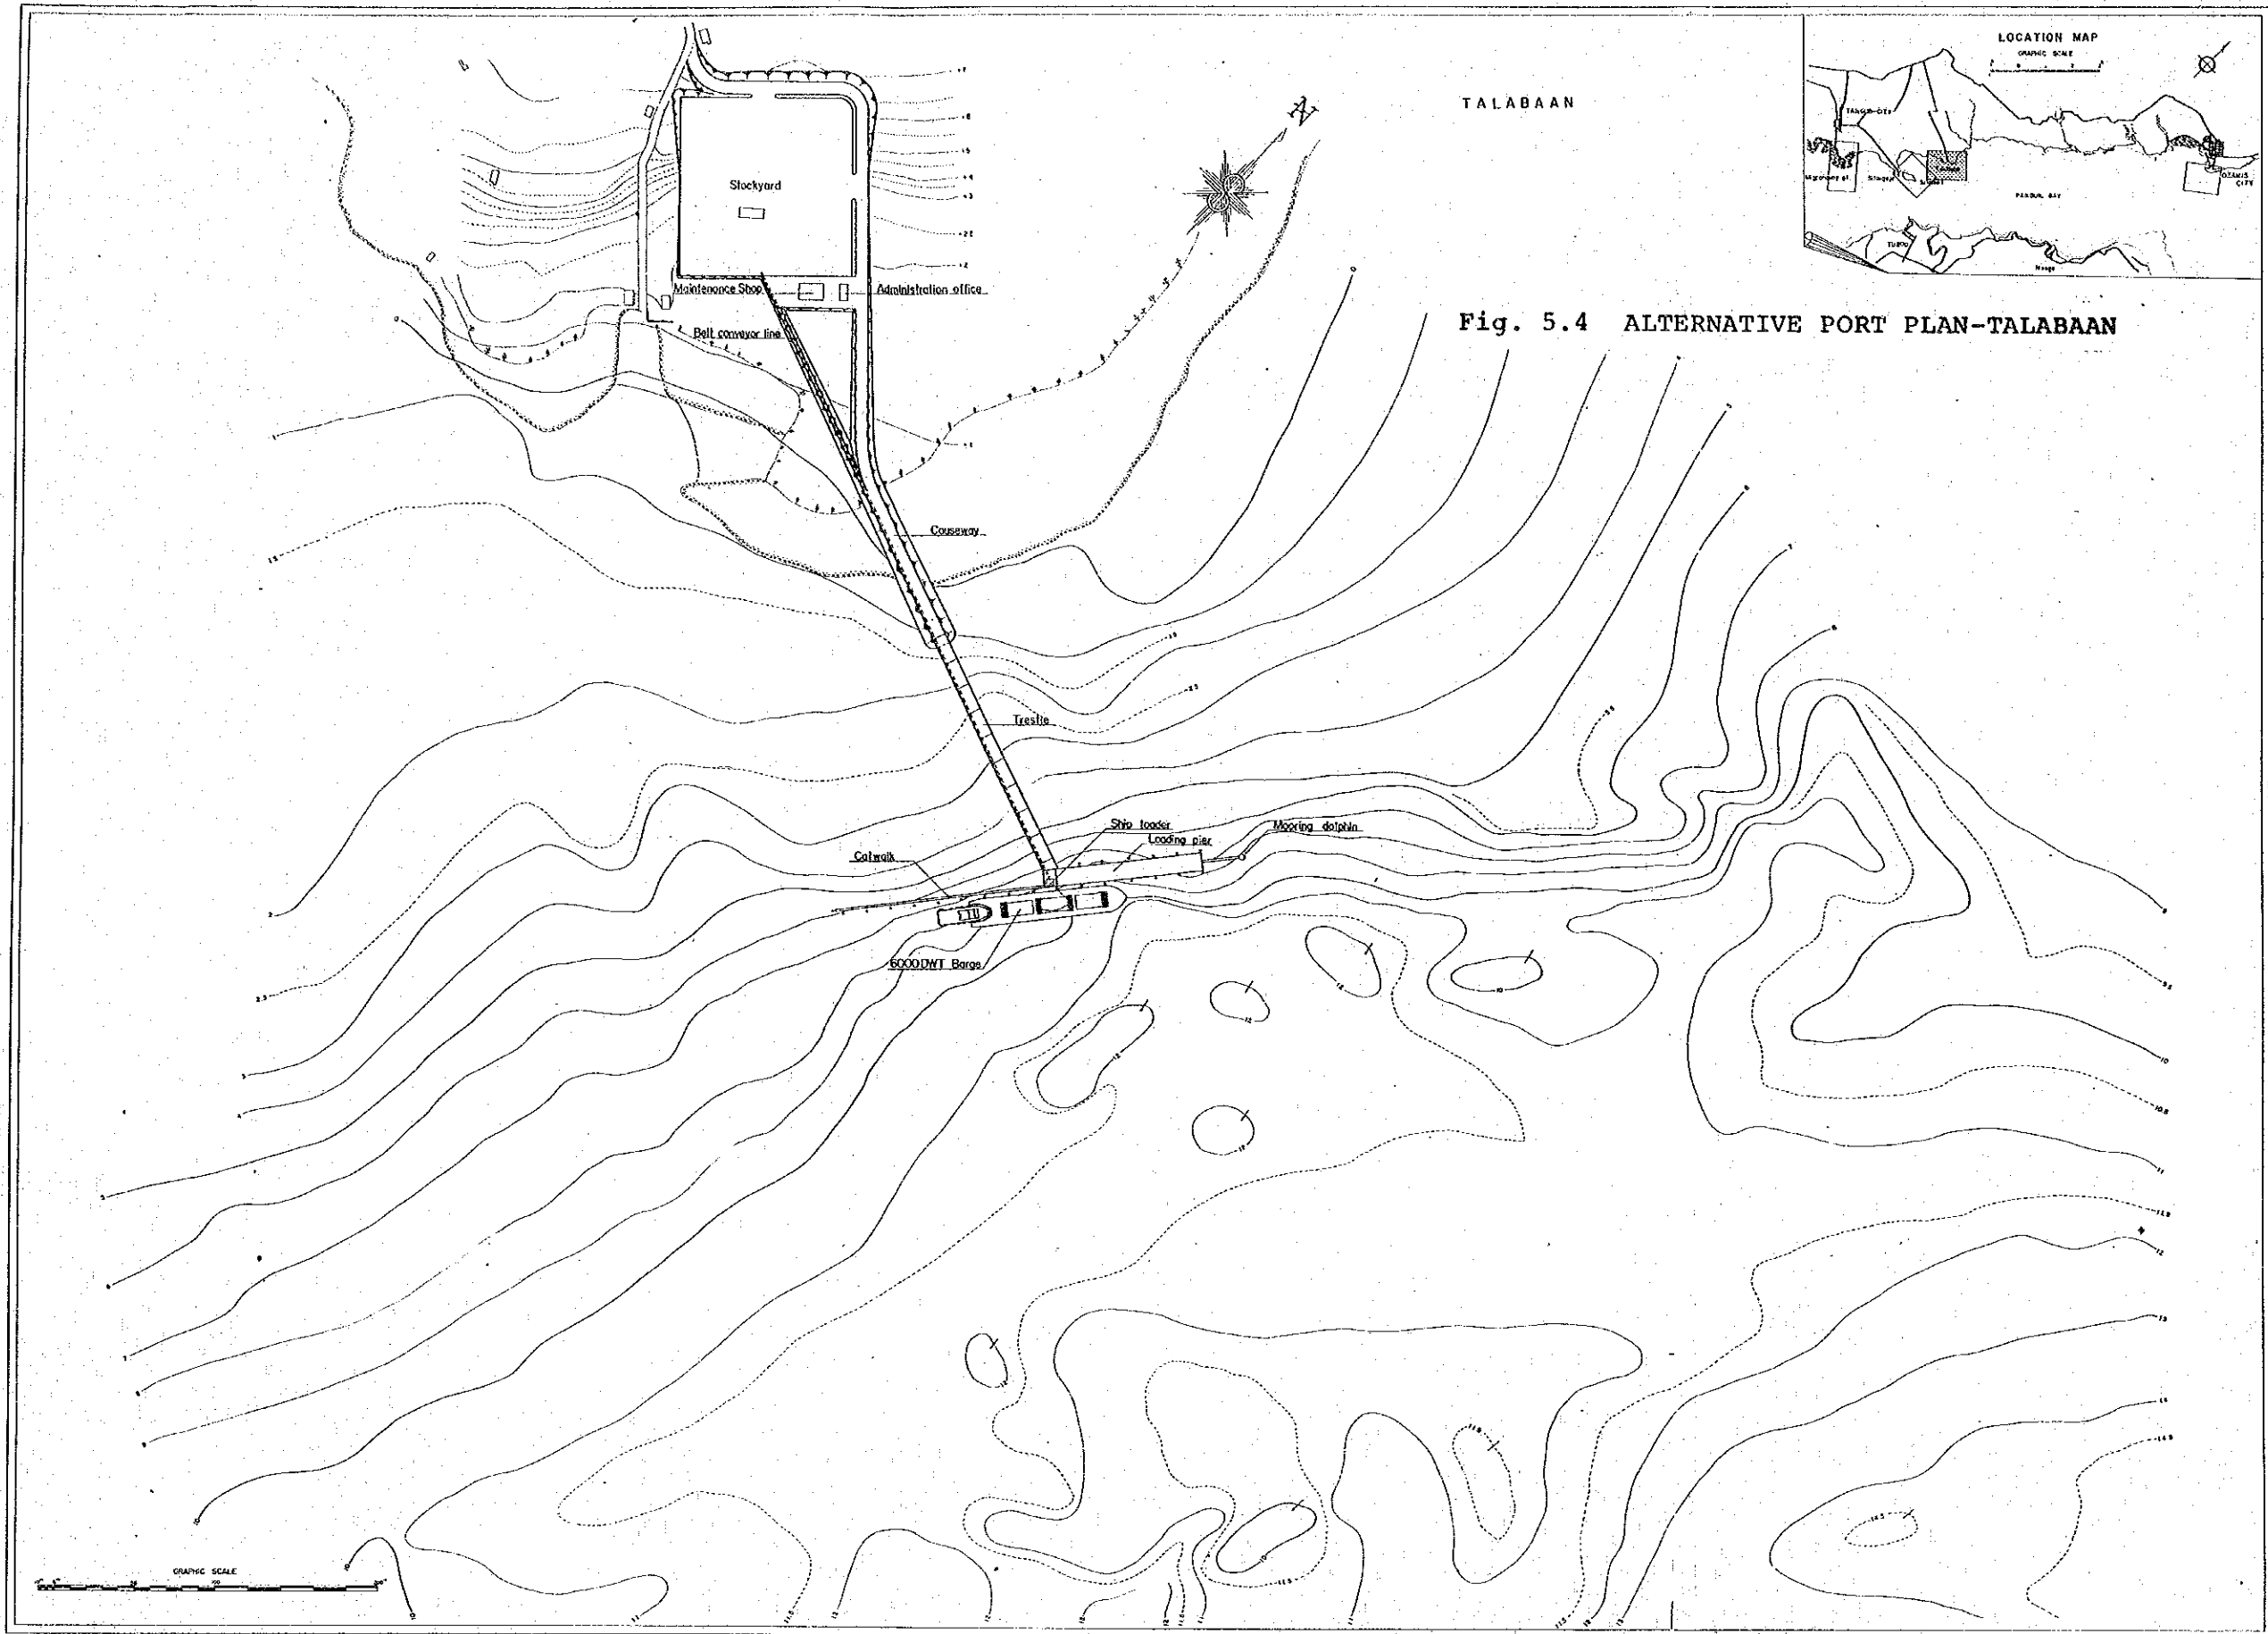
ALTERNATIVE PORT PLAN-TALABAAN
